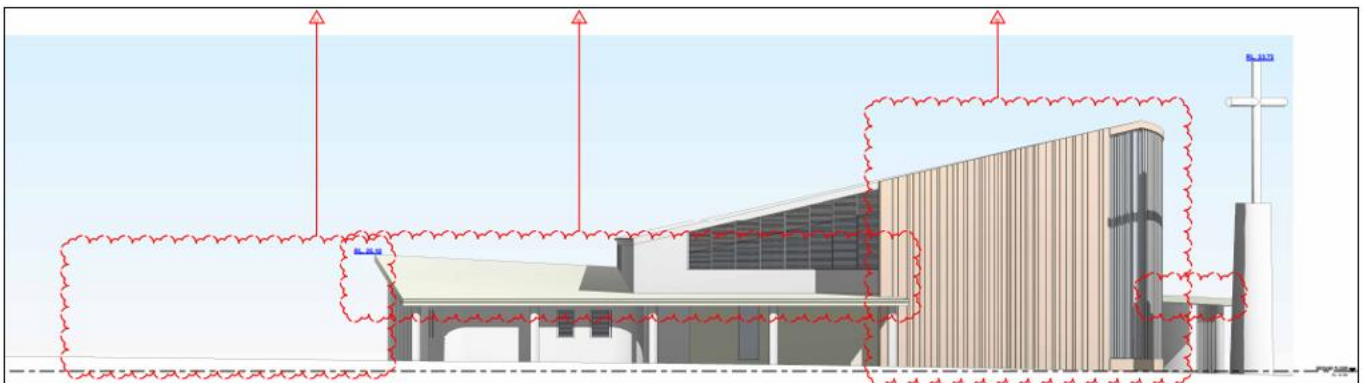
| Proposed changes to external façade and roof features (east elevation) (Source: Applicant’s RtS, 2026)
